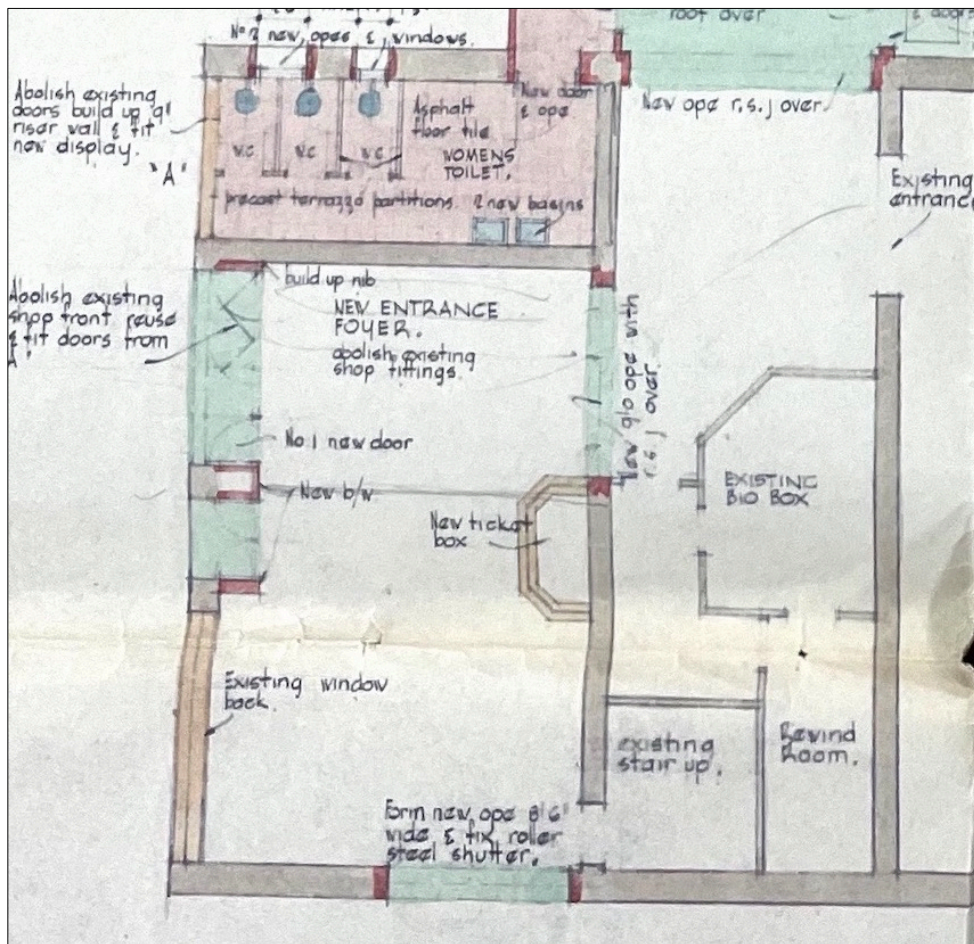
1950 floor plan showing the two original shops replaced by a new foyer, and original entrance converted into women's toilets. Source: Public Record Office Victoria.
